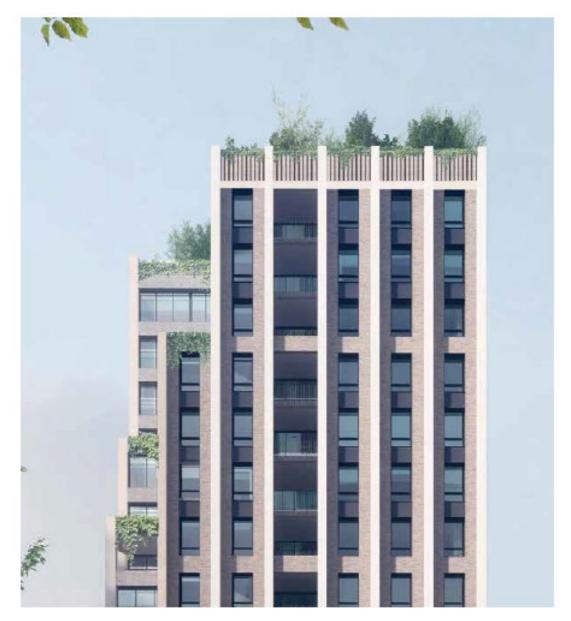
Off-form concrete lintels to provide clear delineation at the top of the façade, also material changes to brickwork for the elevational treatment of the tower
